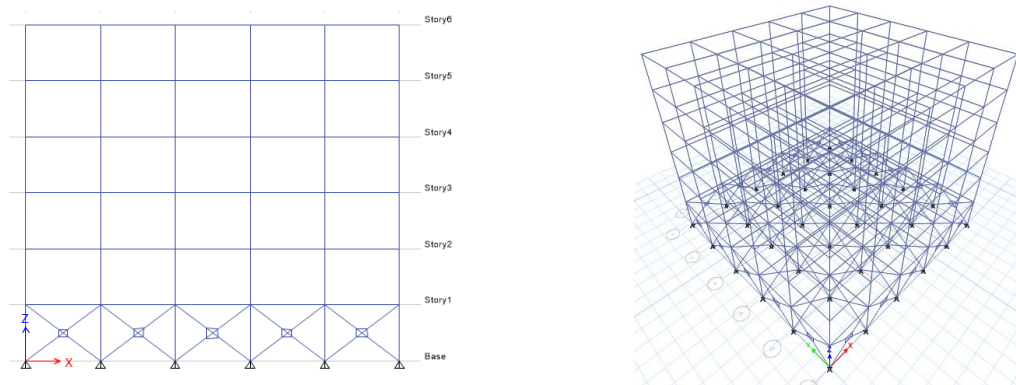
2D and 3D view of steel frame with dampers at base floor
